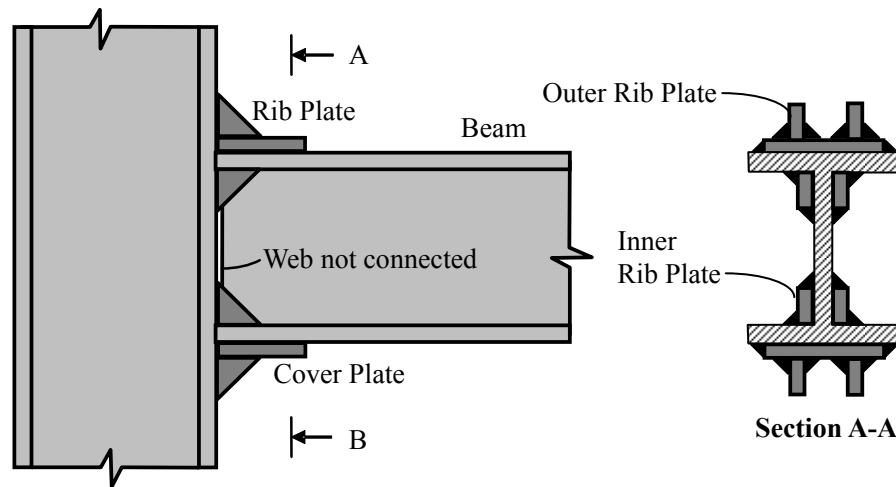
Cover Plated Rib Plated Welded Strong-Axis Moment Connection Configuration in Parallel Flange Sections: Cover Plates Transfer Part of Moment in the Form of Axial (Compressive and Tensile) Forces while (Outer) Rib Plates Transfer Axial and Shear Forces
